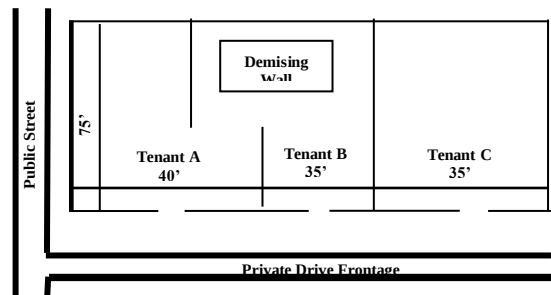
Horizontal multiple tenant building not oriented toward street frontage - Tenant A, B and C would be permitted to place a sign on the elevation that faces the public street provided that the total square footage of all three signs does not exceed 75 square feet
